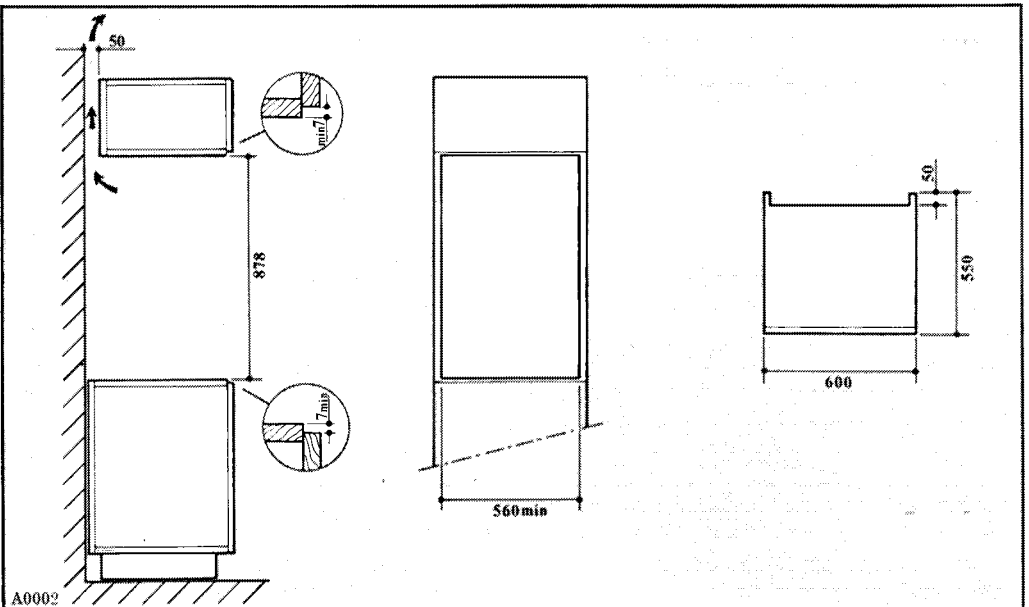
Dimensions of the recess for building into a kitchen unit (mm).
